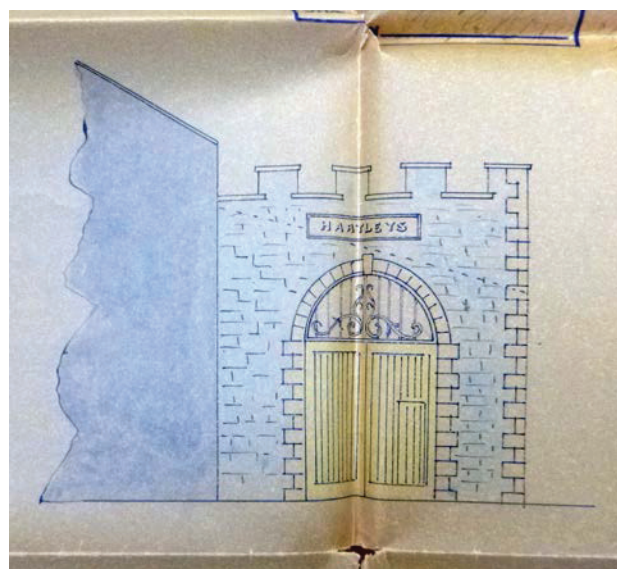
(right): Elevation to street for proposed addition to the Old Brewery, 1912
